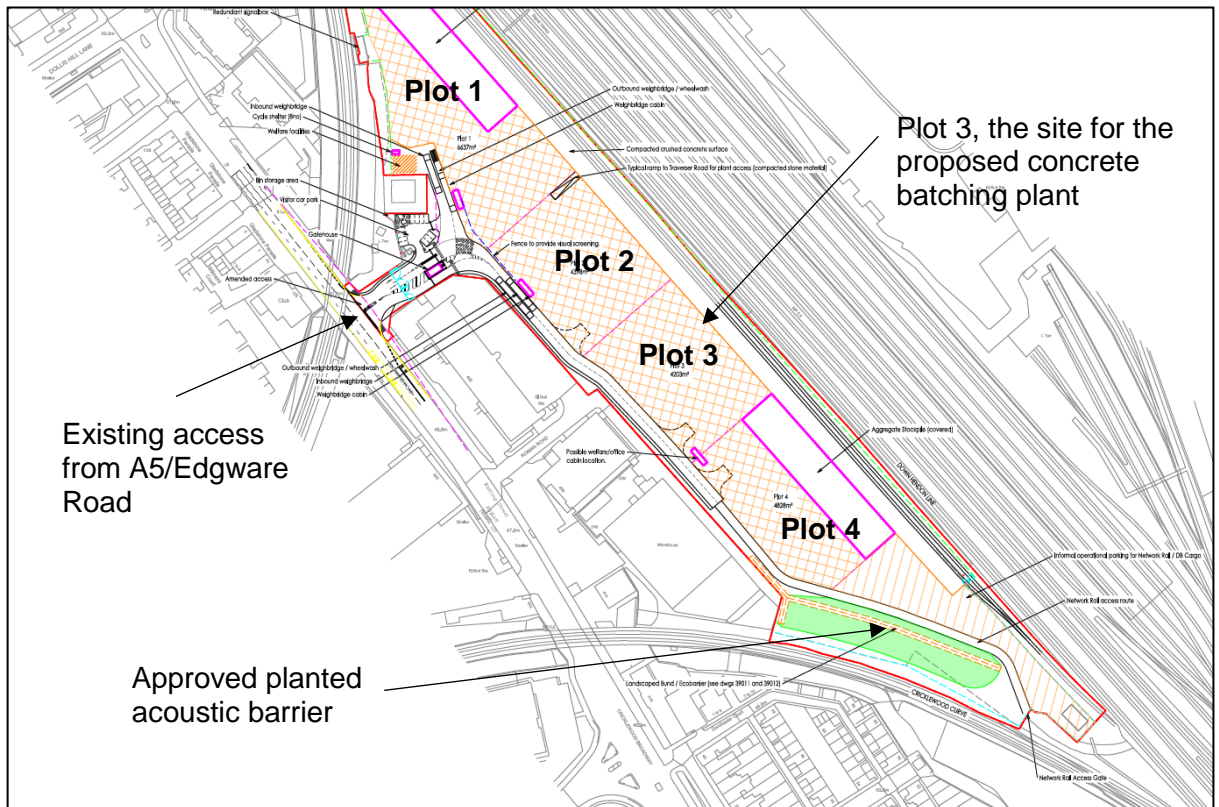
Plot layout, access and acoustic barrier approved for the Rail Freight Facility under application 17/5761/EIA (as amended)
